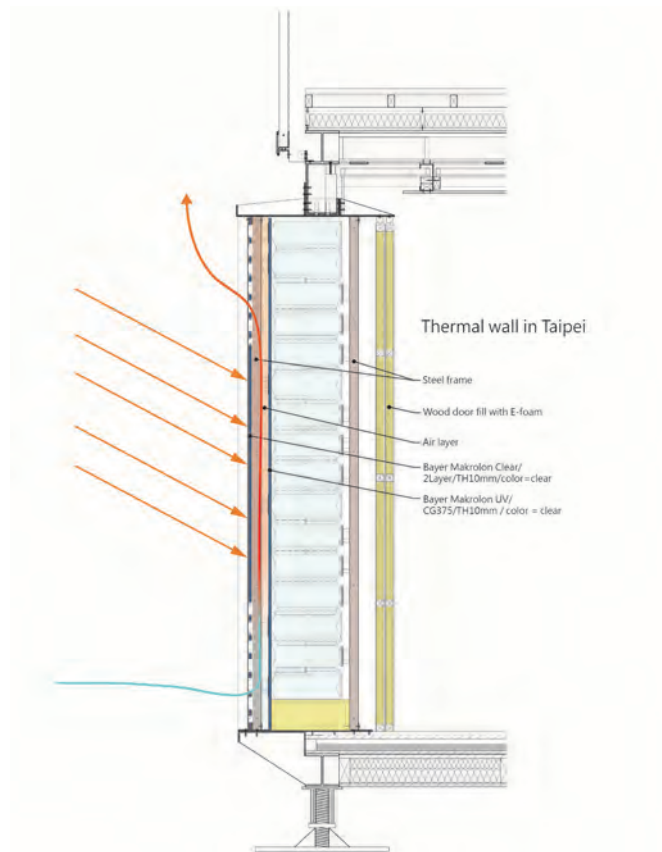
Thermal Wall Detail in Taipei
